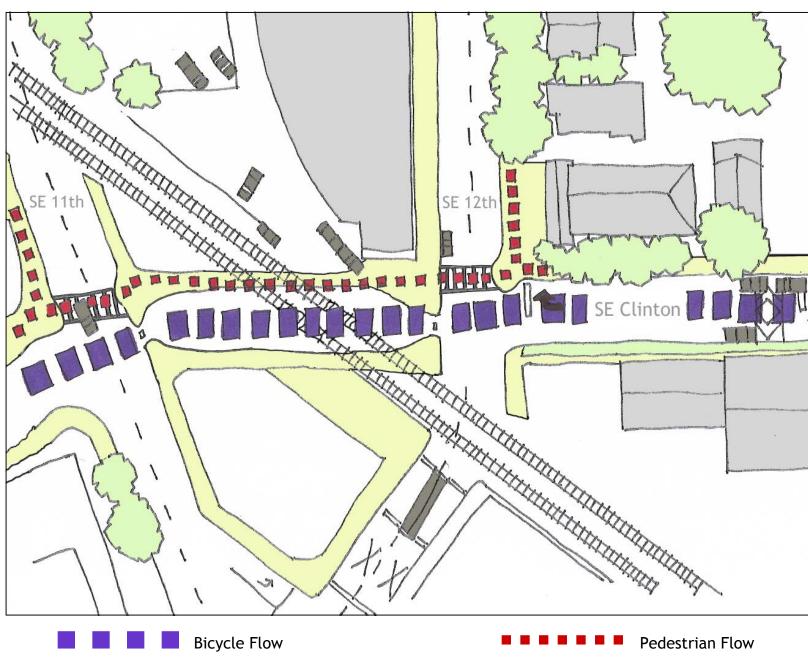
Alternative 2 Crossing: Limited Access Street, Curb Extensions and a Marked Crosswalk
